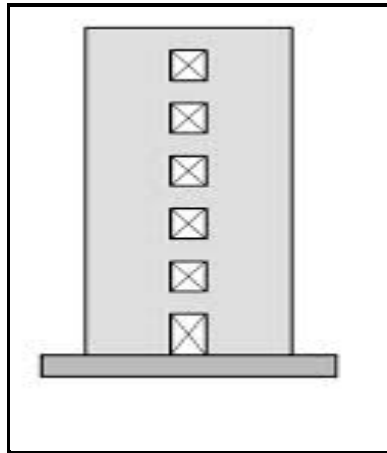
Stiffened Coupled Shear Wall System (URL12).
